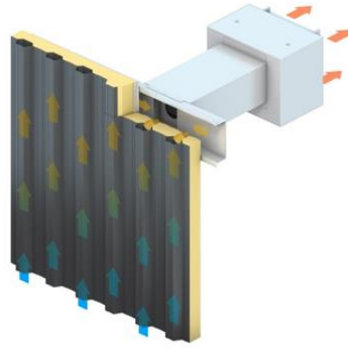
Solar air heating façade BISTS with auxiliary heating system (Kingspan n.d.).
